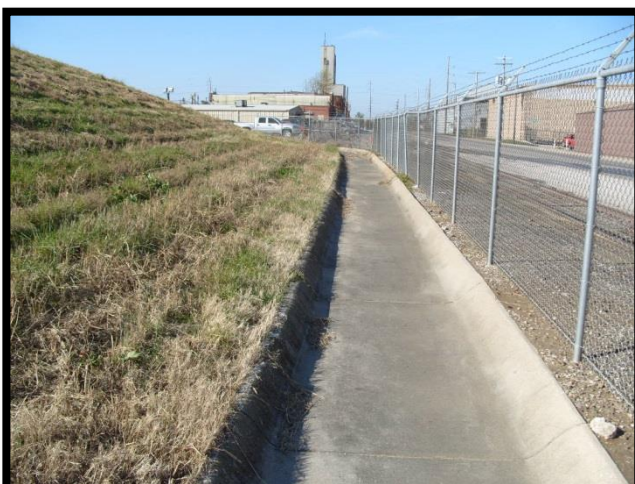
Concrete drainage swale, east side of Taracorp pile (view north).
